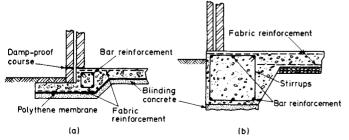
Reinforced concrete raft foundations. (a) With upstand beam; (b) with downstand beam
